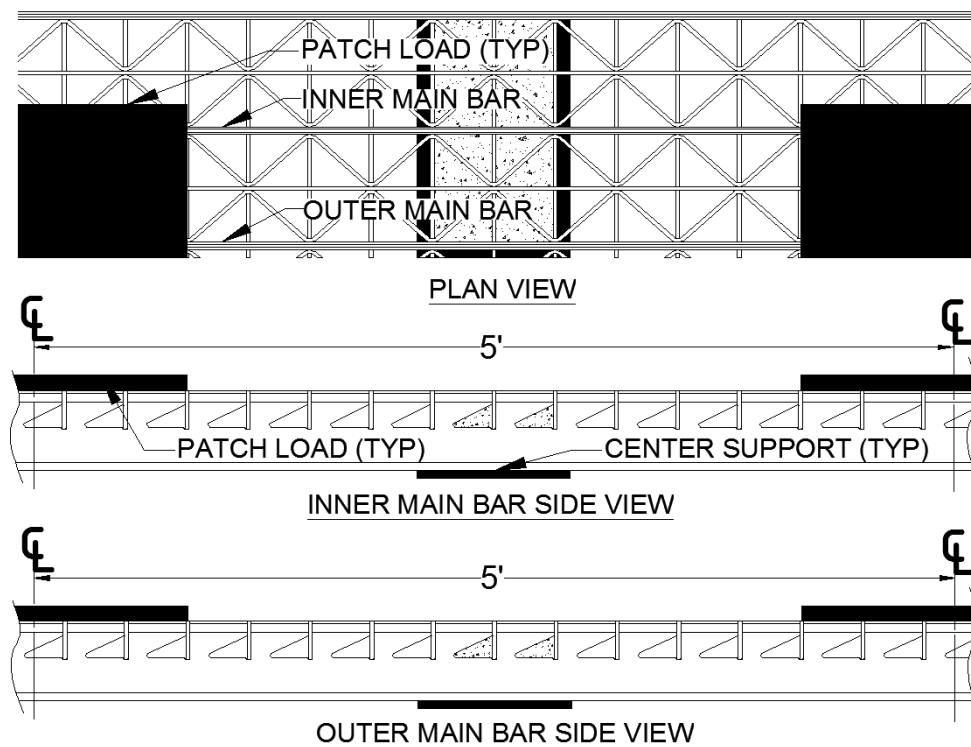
Plan and side view of critical area for fatigue cracking
